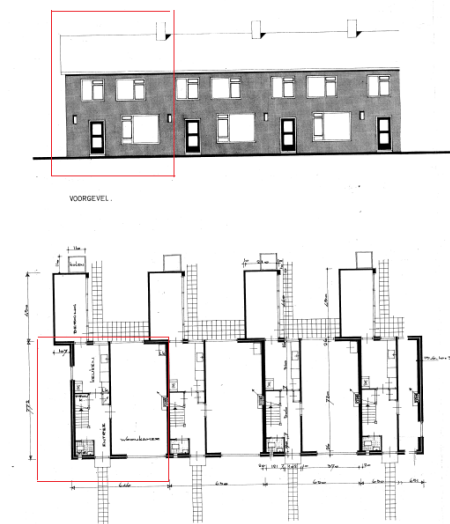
TERRACED-HOUSE PLAN AND FRONT VIEW
